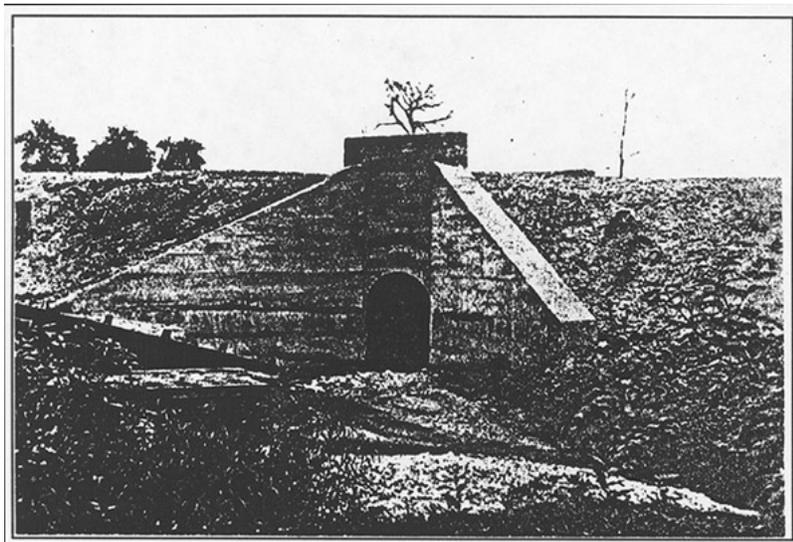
1903 arched concrete culvert (Source: Maryland Geological Survey 1903: Plate XI, Figure 2).
